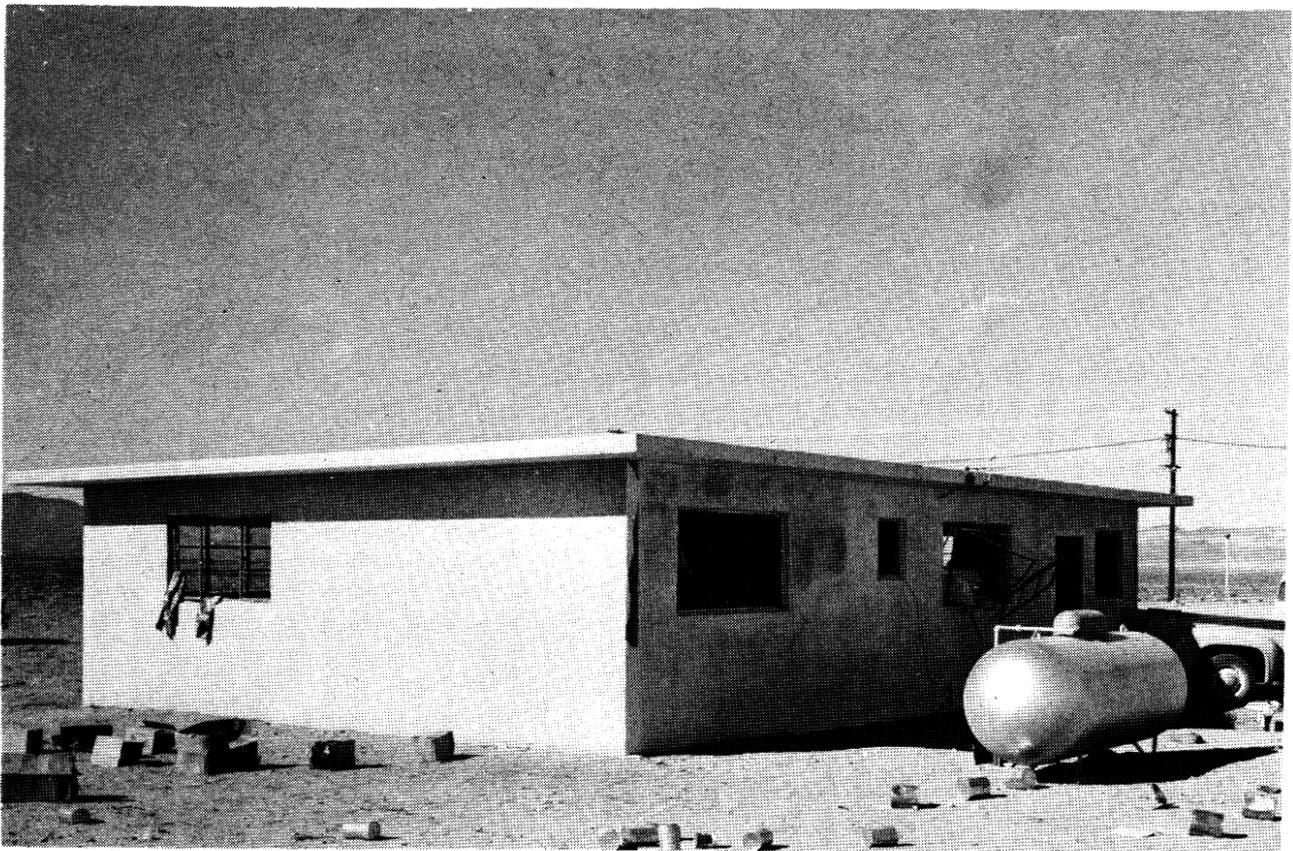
Reinforced precast concrete house after the nuclear explosion (5 psi overpressure). The LP-gas tank, sheltered by the house, is essentially undamaged.
